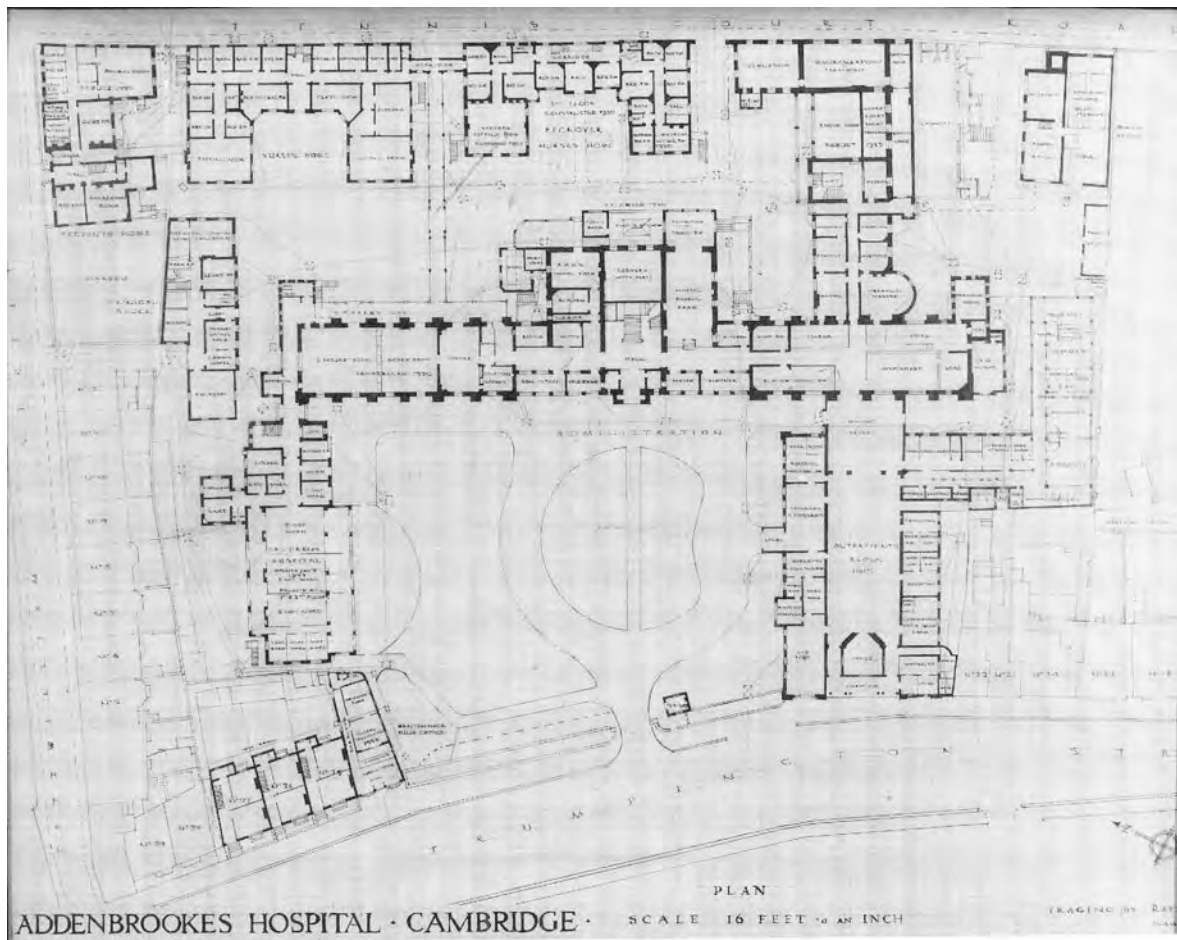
Floor plan of Addenbrooke's Hospital circa 1934 (after Rook et al. 1991)
